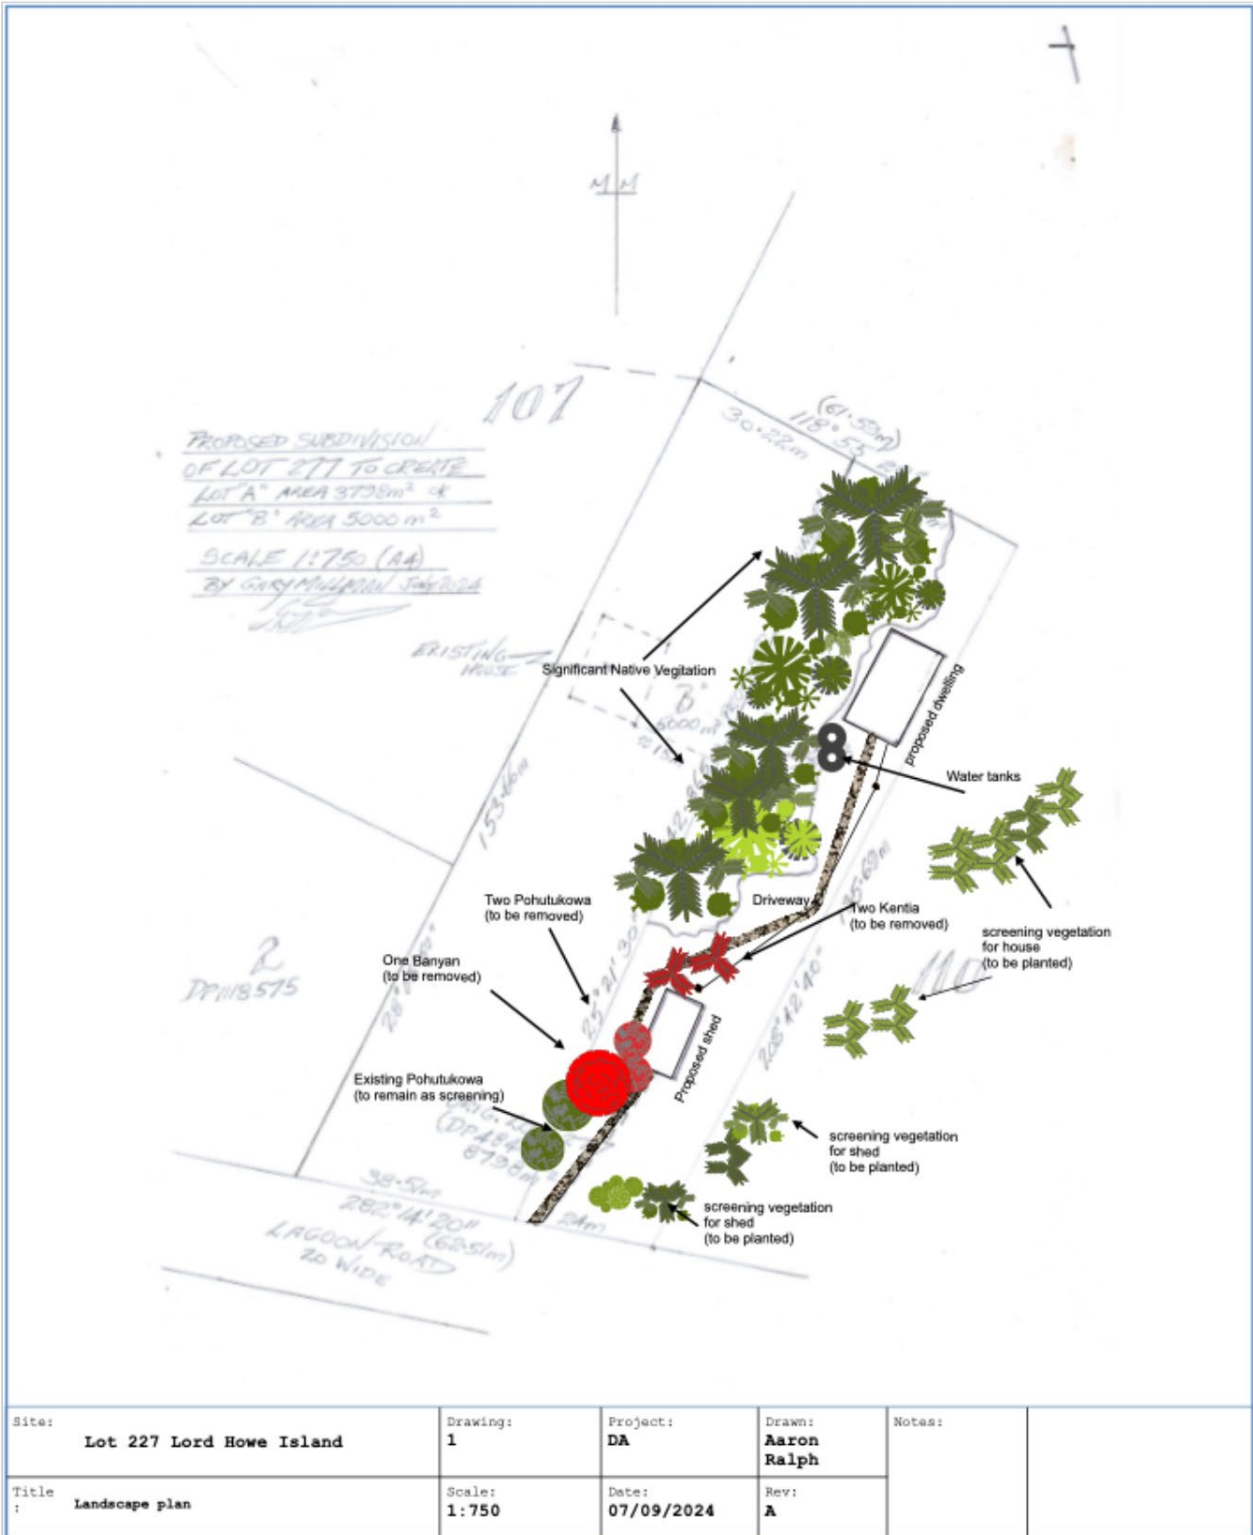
Proposed landscaping plan for development including landscape screen plantings on adjoining lease
